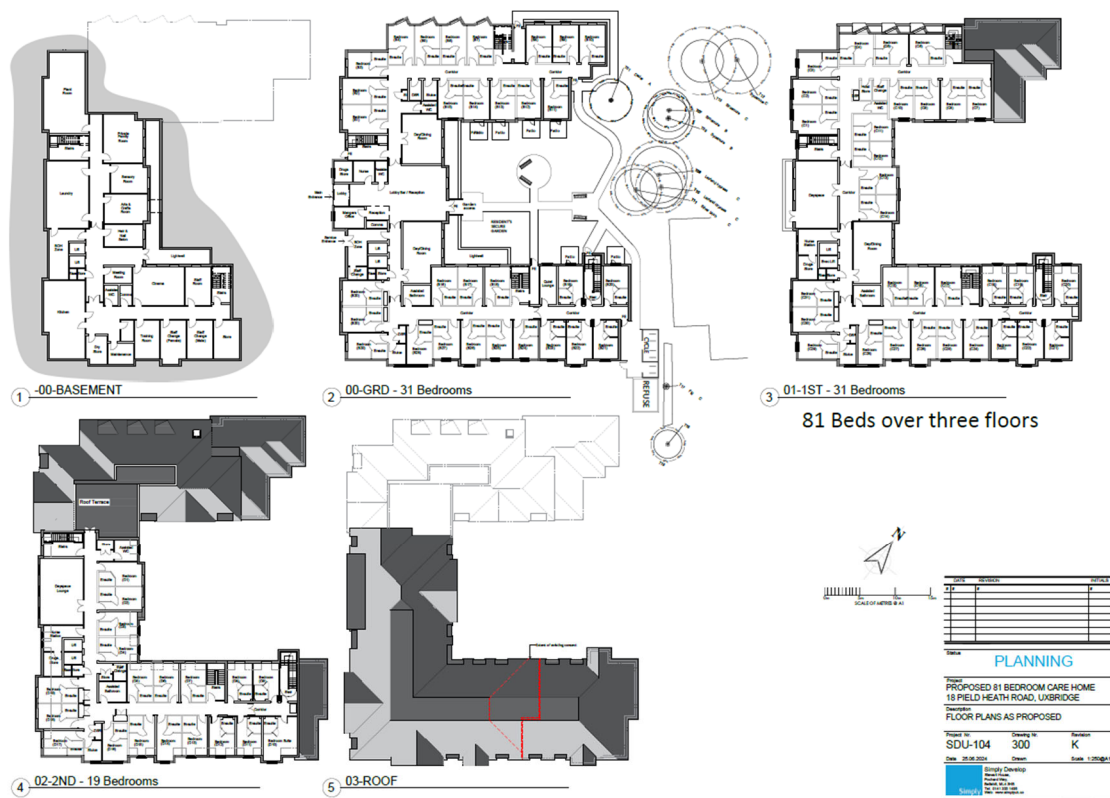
Proposed Floor and Roof plans (please note – a larger version of plan can be found in the Committee Plan Pack)
